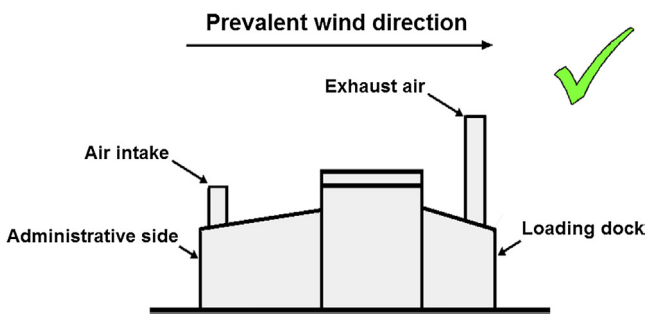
The plant building should be positioned so that prevailing winds hit the visitor parking lot and administrative side of the building. Loading docks and refrigerated warehouses should be orientated on the opposite side, away from the quarter with maximum sunshine, wind, and/or rain. The air/HVAC intake may not be positioned downwind from exhausts. Exhausted air must be immediately carried away and diluted without entering the factory's air intake system ([Holah et al., 2014](#)).
